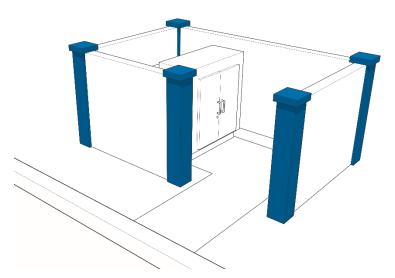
Ground-Mounted Equipment Wall Enclosure
